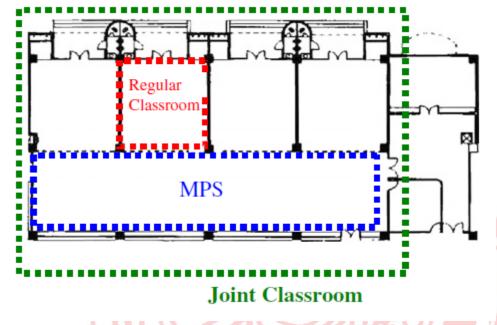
The layout of a join classroom as provided by Chiang and Lai.<sup>18</sup>
